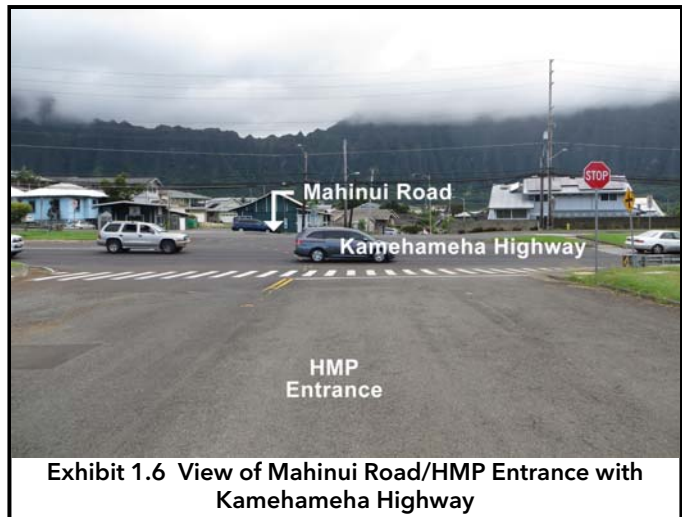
View of Mahinui Road/HMP Entrance with Kamehameha Highway
